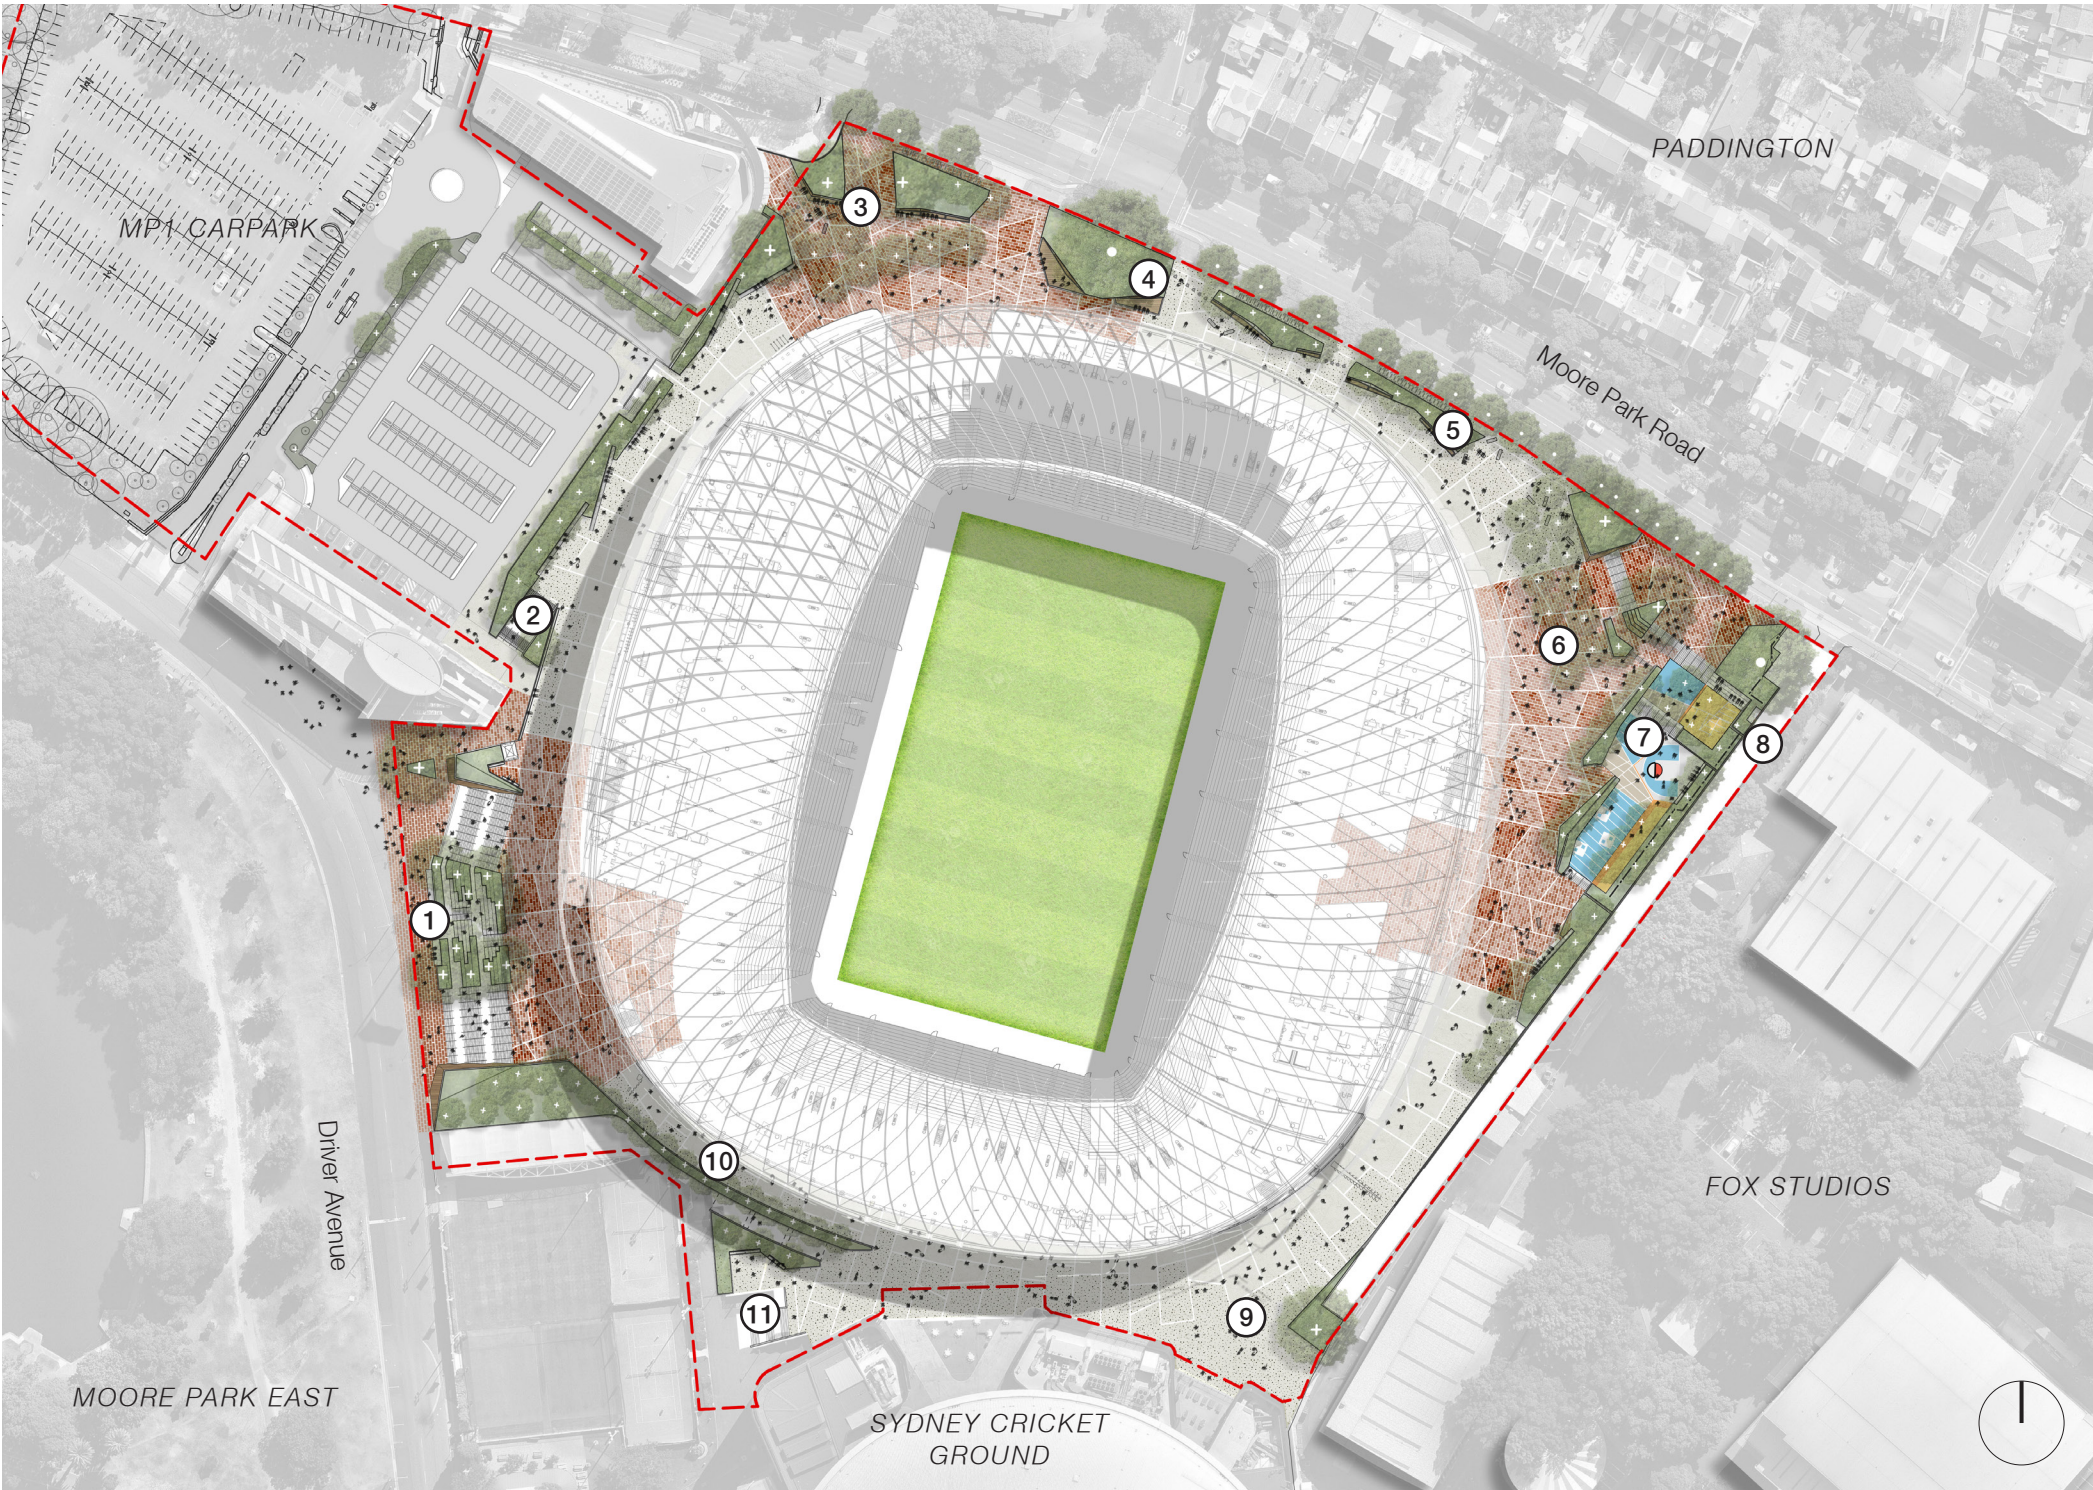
Proposed Sydney Football Stadium Public Plan (Source: ASPECT Studios)
